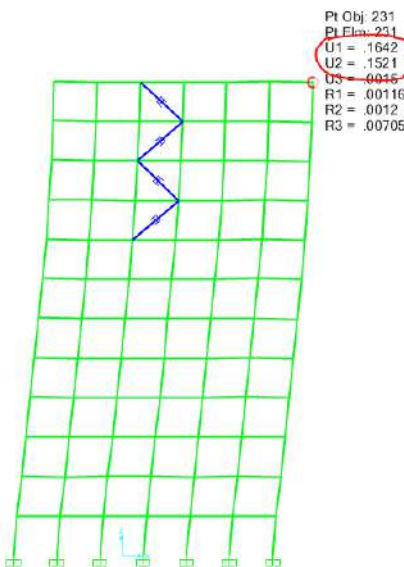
(b): Building with 4 dampers in vertical at front face of X-direction
